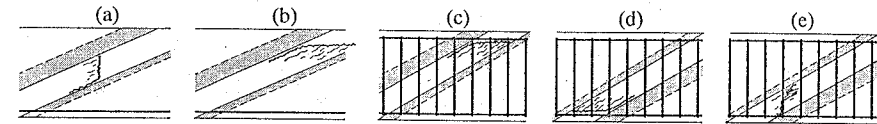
Splitting crack interconnection to form horizontal or vertical compression-shear cracks: (a,b) beams without stirrups; (c-e) beams with stirrups.
